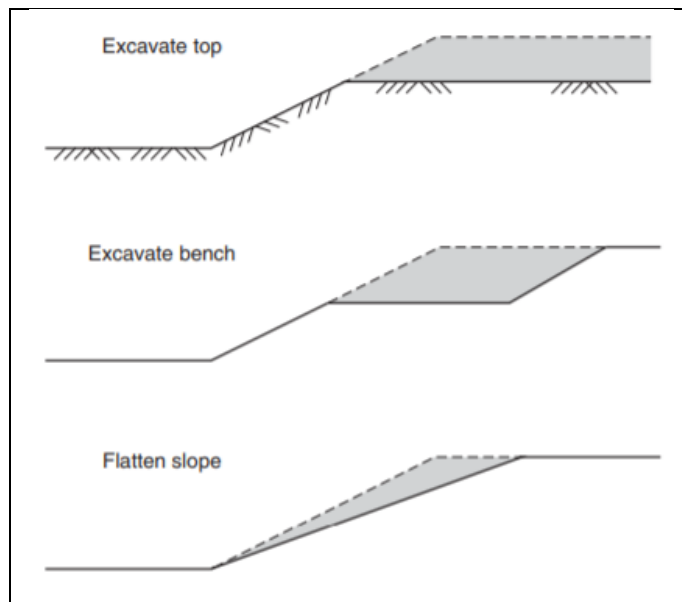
Slope stabilization by excavation (Duncan and Wright, 2005)
